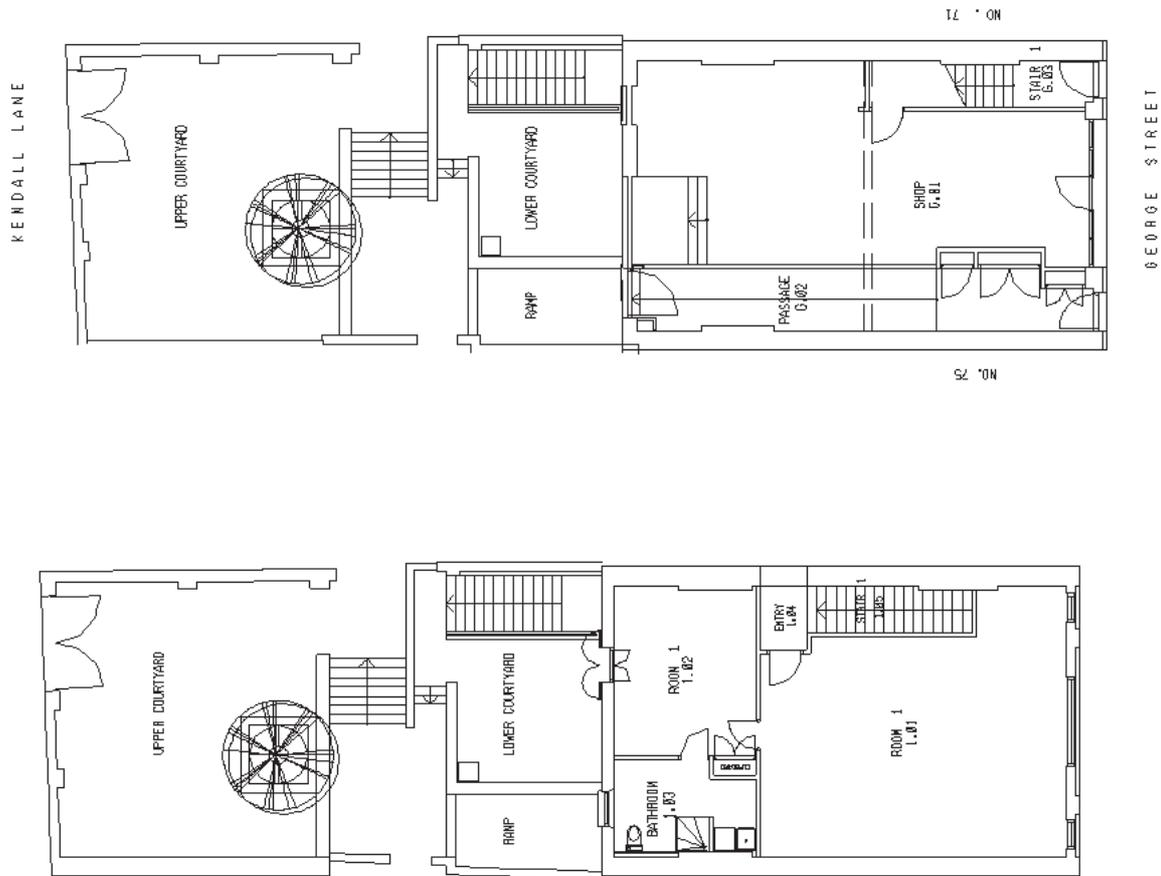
Ground and First Floor Plans of 73 George Street, The Rocks
